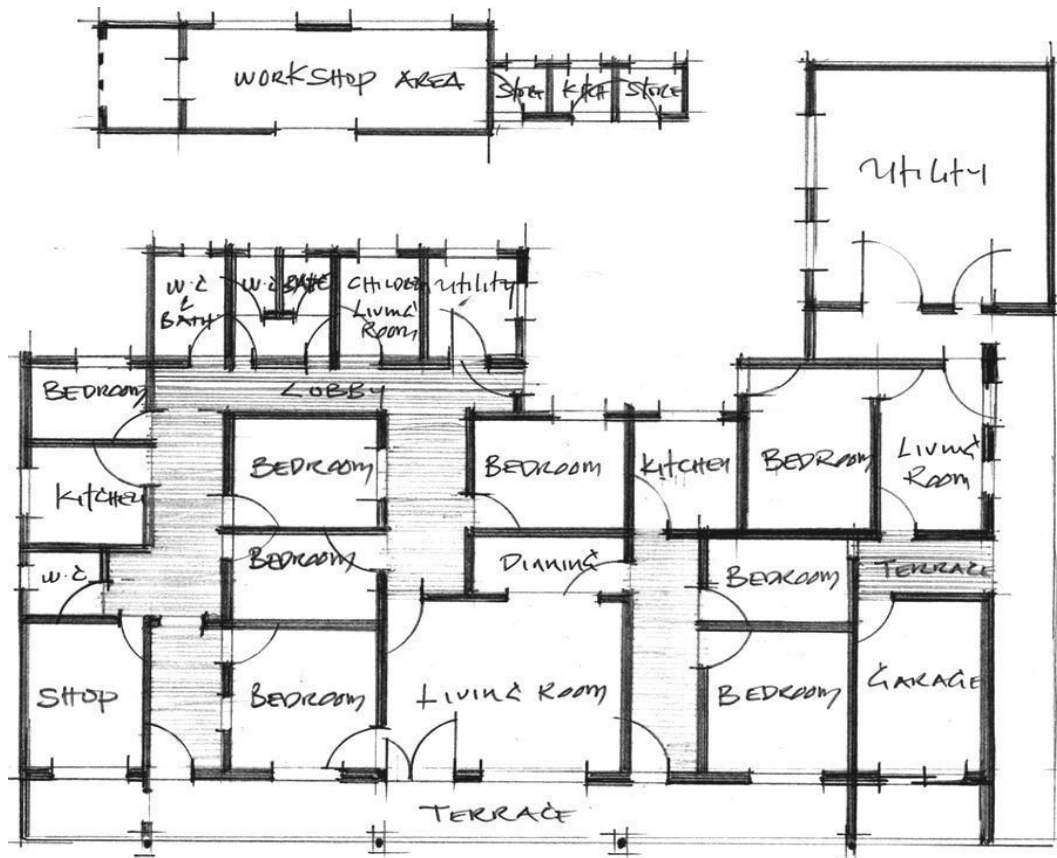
Floor plan of a typical adapted family-compound Benin house
